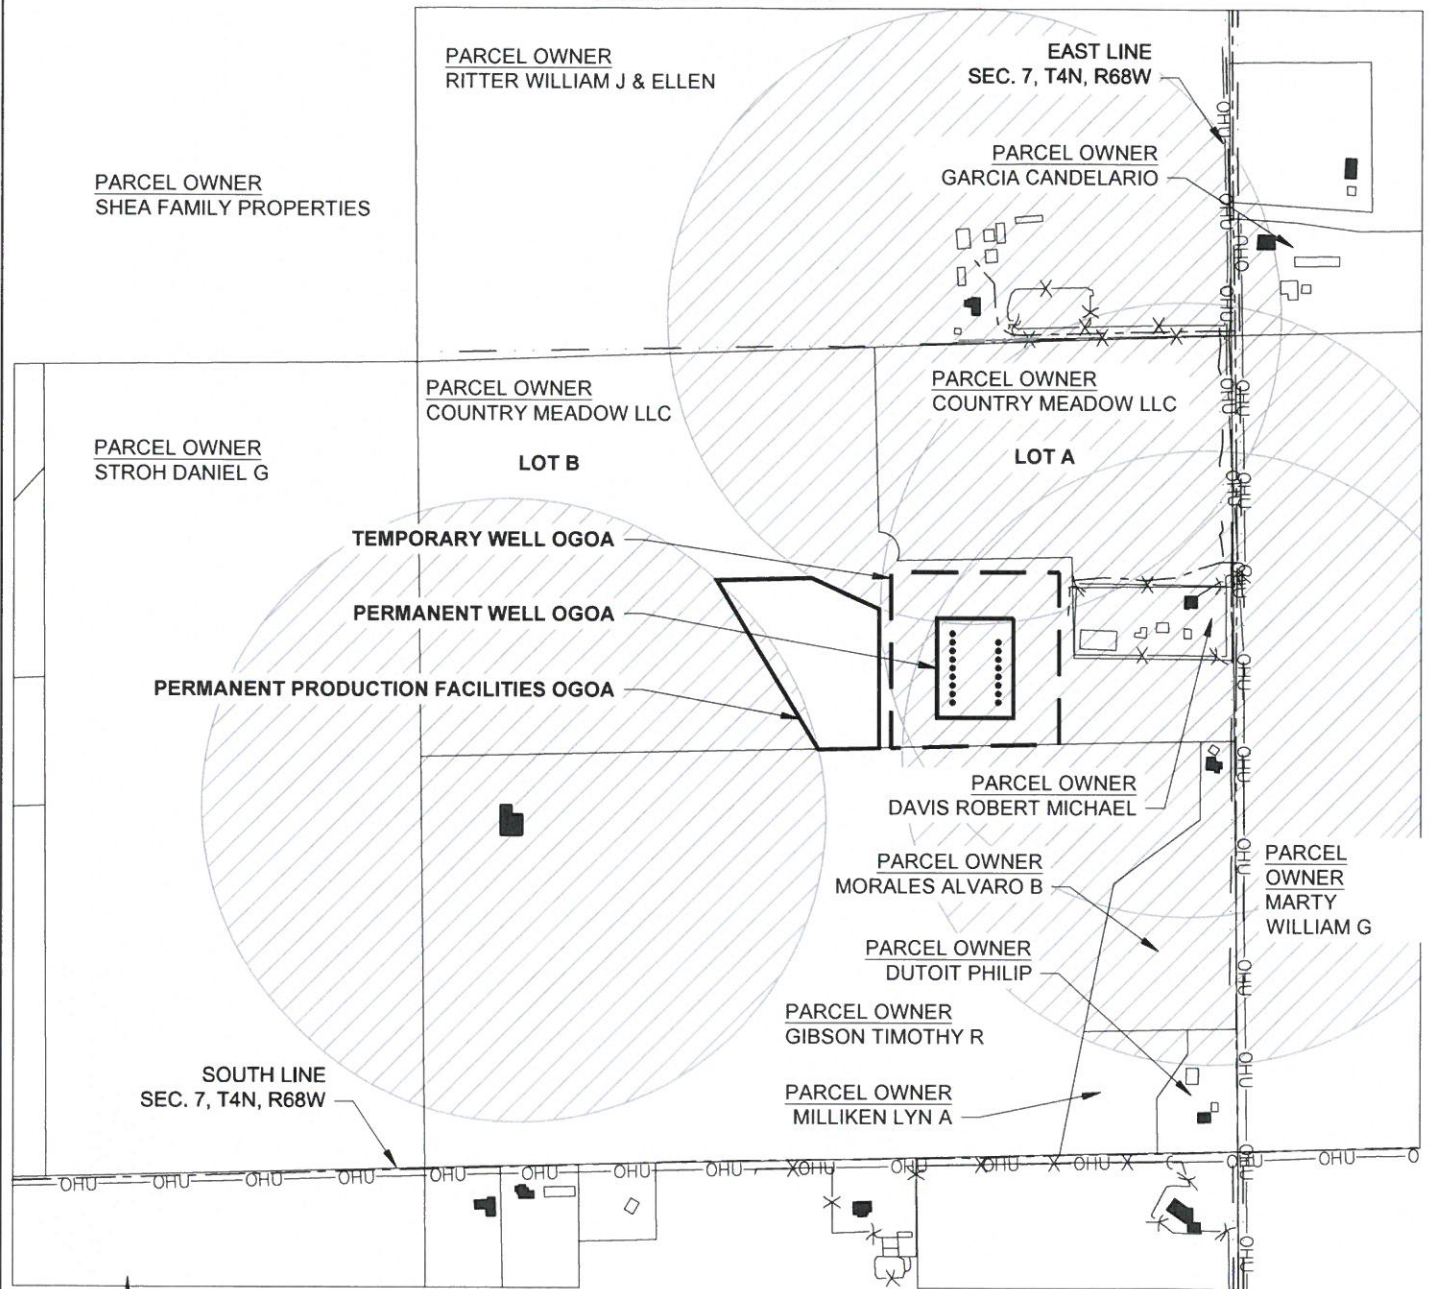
L PAD OGOA SITE PLAN
